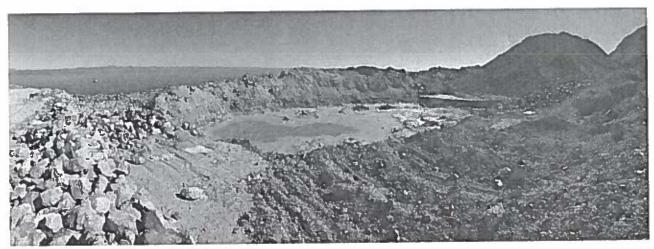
Shore line slope with armor rock protection to reduce excessive erosion. (02/16/16)
